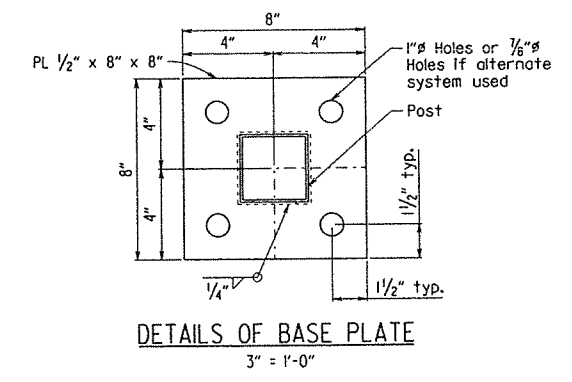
DETAILS OF POST ANCHOR SYSTEM (CAST IN PLACE ANCHORS)
